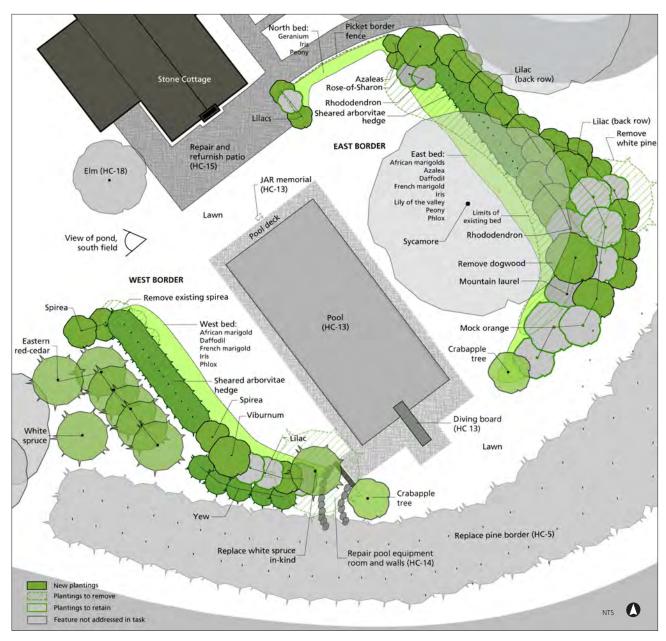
Conceptual planting plan for the pool terrace garden. (SUNY ESF)
